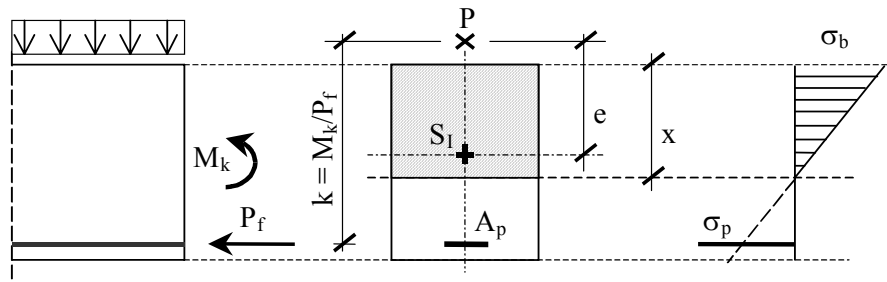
Prestressed, cracked section subjected to bending
